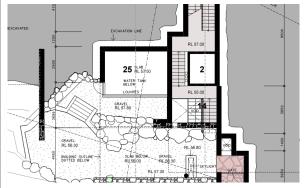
Proposed plantroom in the basement level 4 labelled '25' (Source: HSA)
